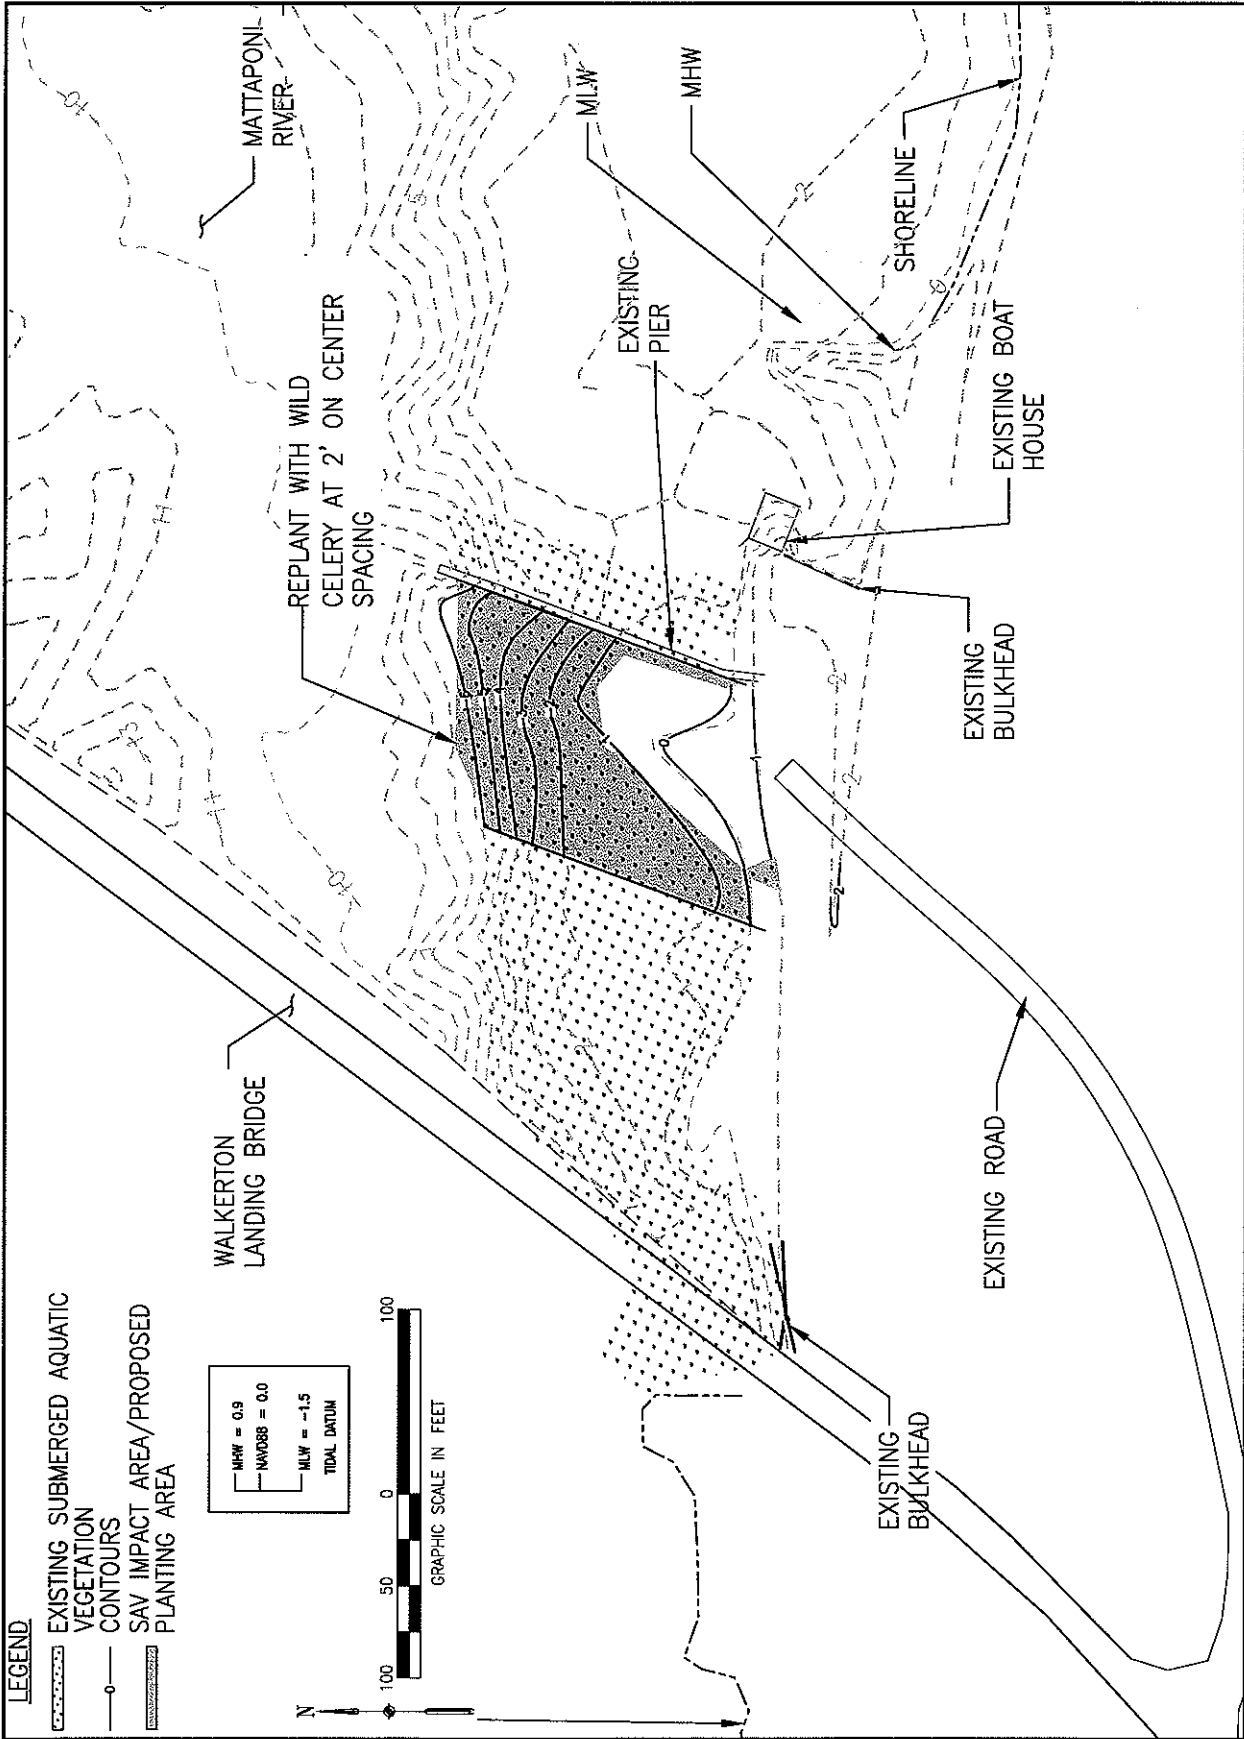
PROPOSED PLANTING PLAN FOR SUBMERGED AQUATIC VEGETATION (SAV) RESTORATION PLAN, LARGE COMPONENT TRANSPORT ROUTE ROLL-OFF FACILITY
